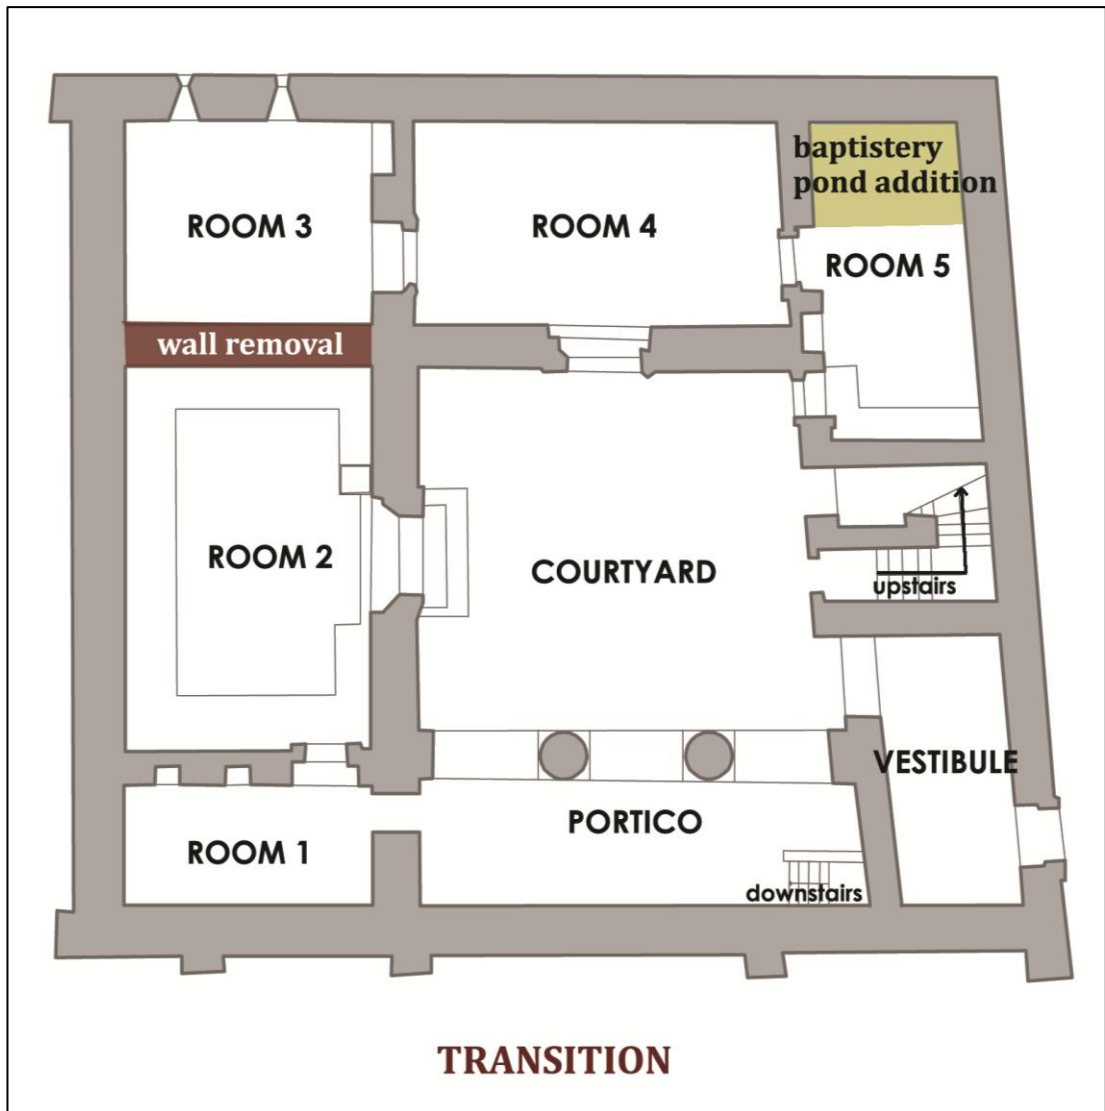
The plan demonstrating the transition in the House-Church (after Kraeling, 1967, p. 35)
